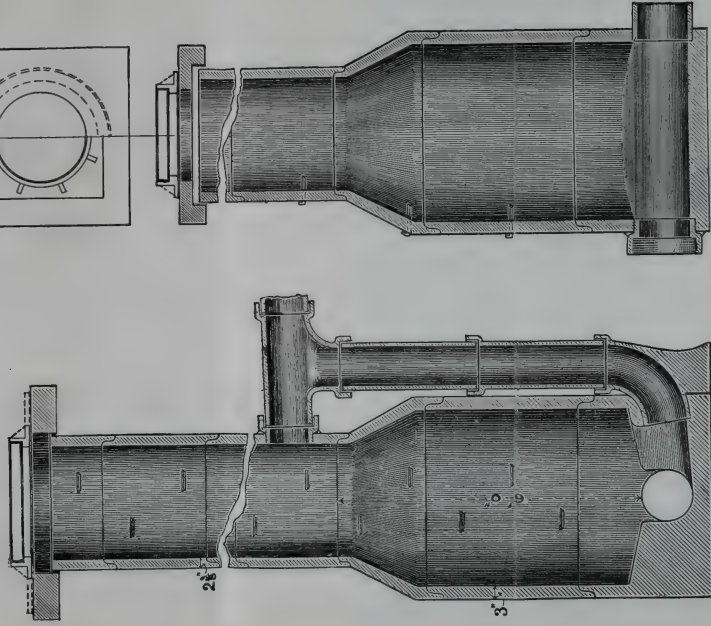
Manholes in Concrete Tubes, with Cascade Branch Sewer and Special Stoneware Junction Block and Froghead; Sharp, Jones & Co.
